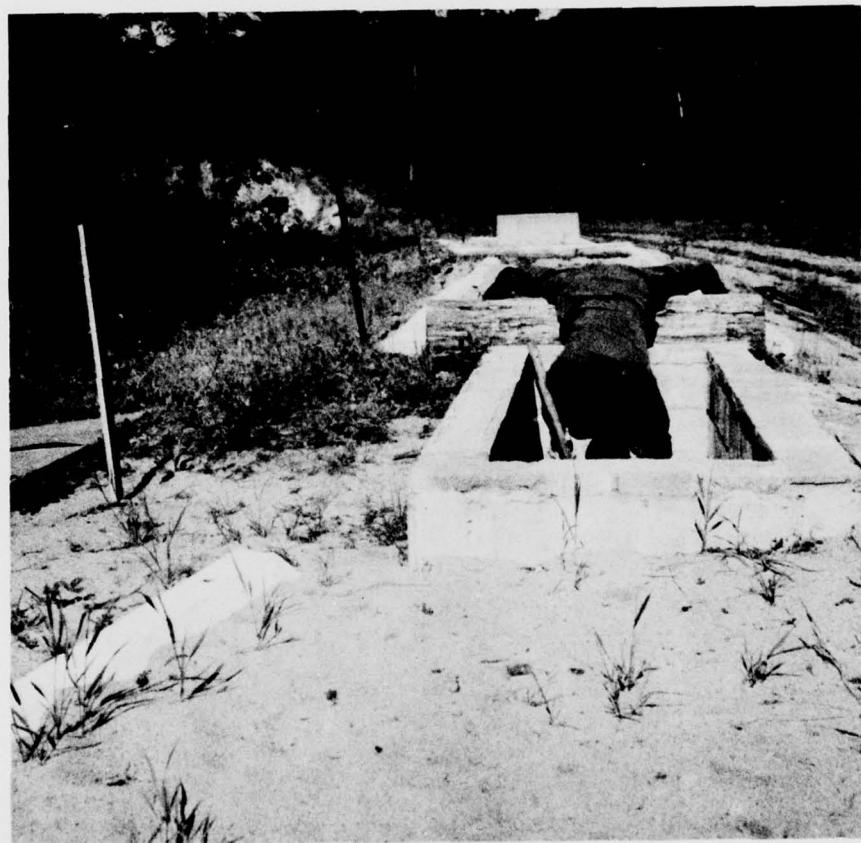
Concrete Block Pit, concrete block walls with earth floor,  $2.4 \times 0.8 \times 0.9$  m deep. Subjects crawl in and out.
